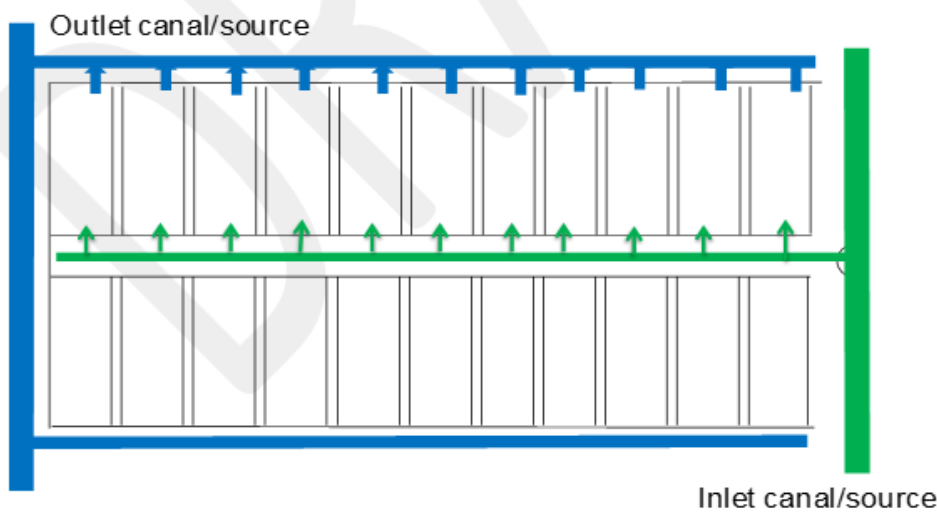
Fish Farm Layout with Inlet and Outlet Structures
